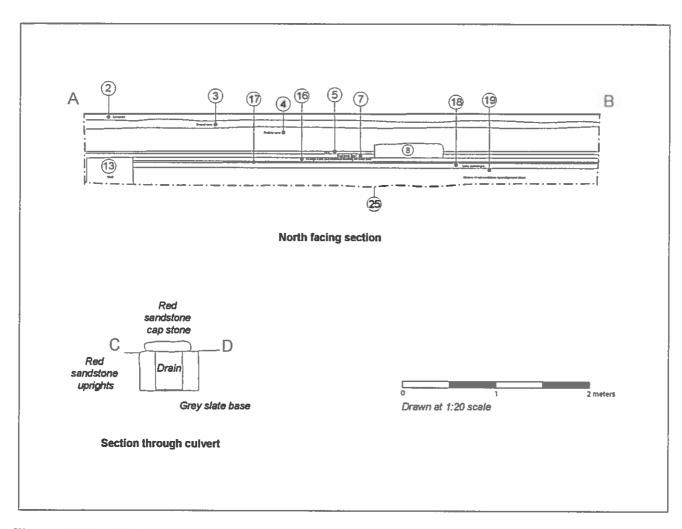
North facing section of foundation trench at southern end and section through stone culvert.
